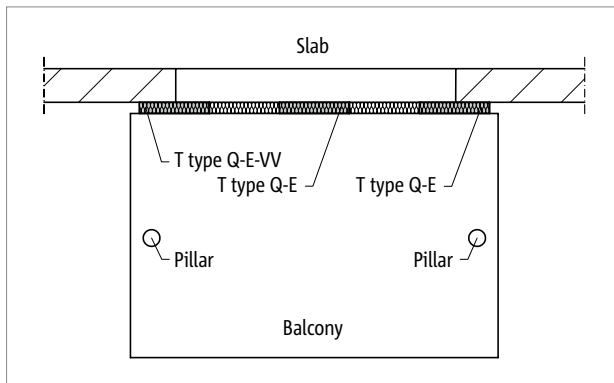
Schöck Isokorb® T type Q-E, Q-E-VV: Balcony with pillar support
